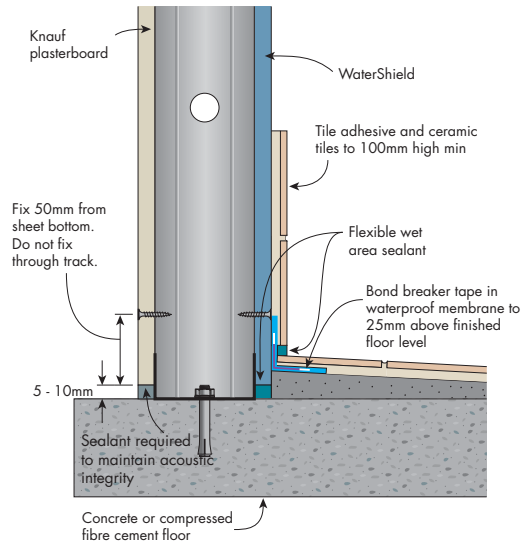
Wall Base in Wet Areas (Outside Shower)
